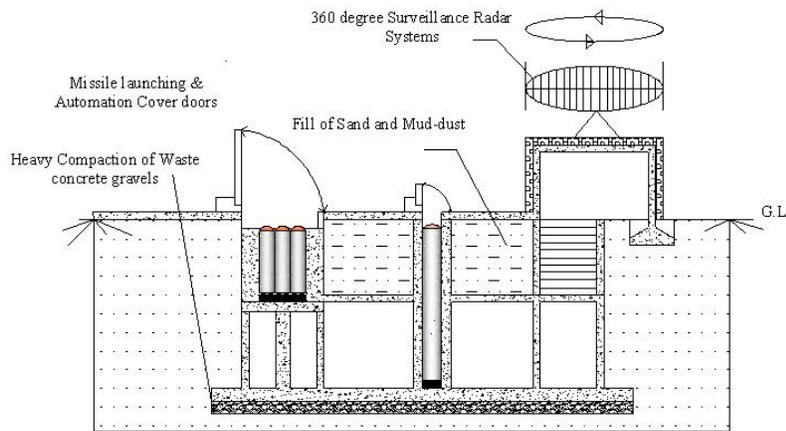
Section Elevation in Army Trench Base of Concrete Bunker (included features)
